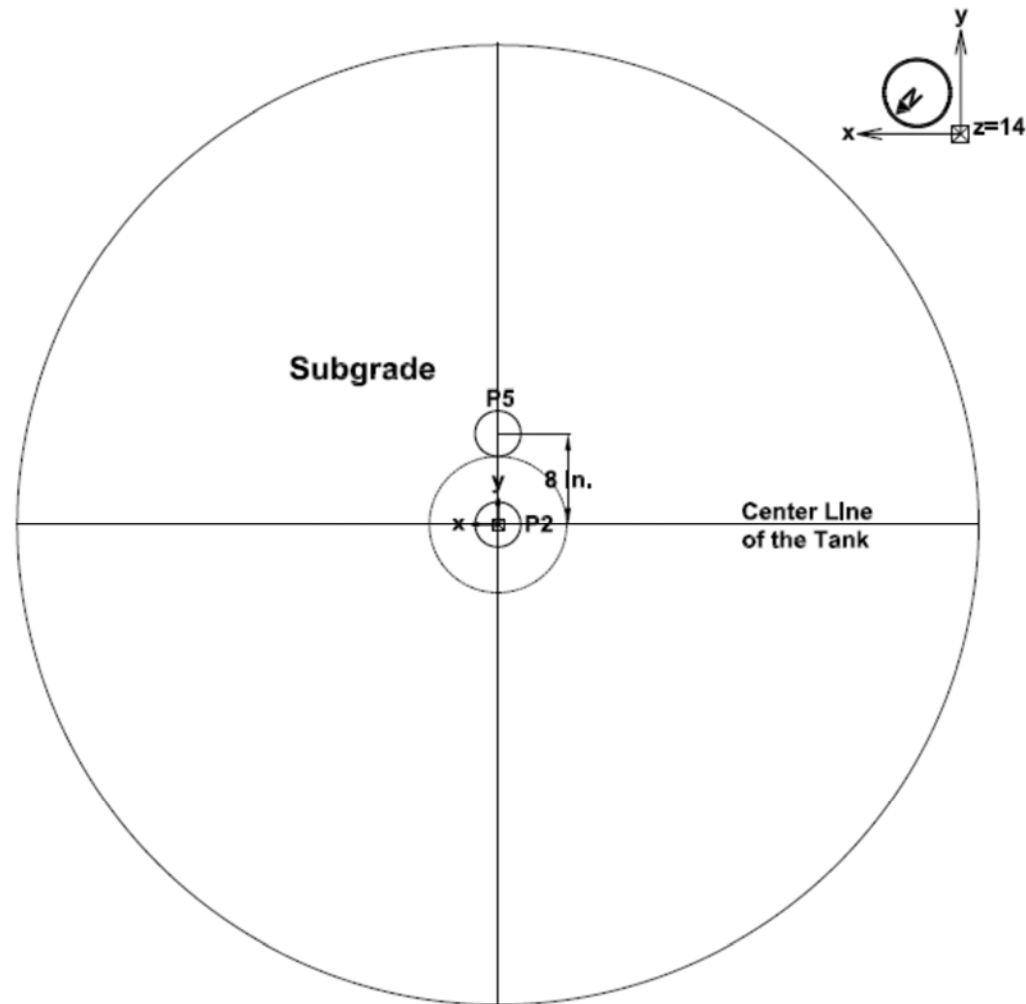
Instrumentation plan for experiment No. 3—Plan view, $Z = 14$ inches
